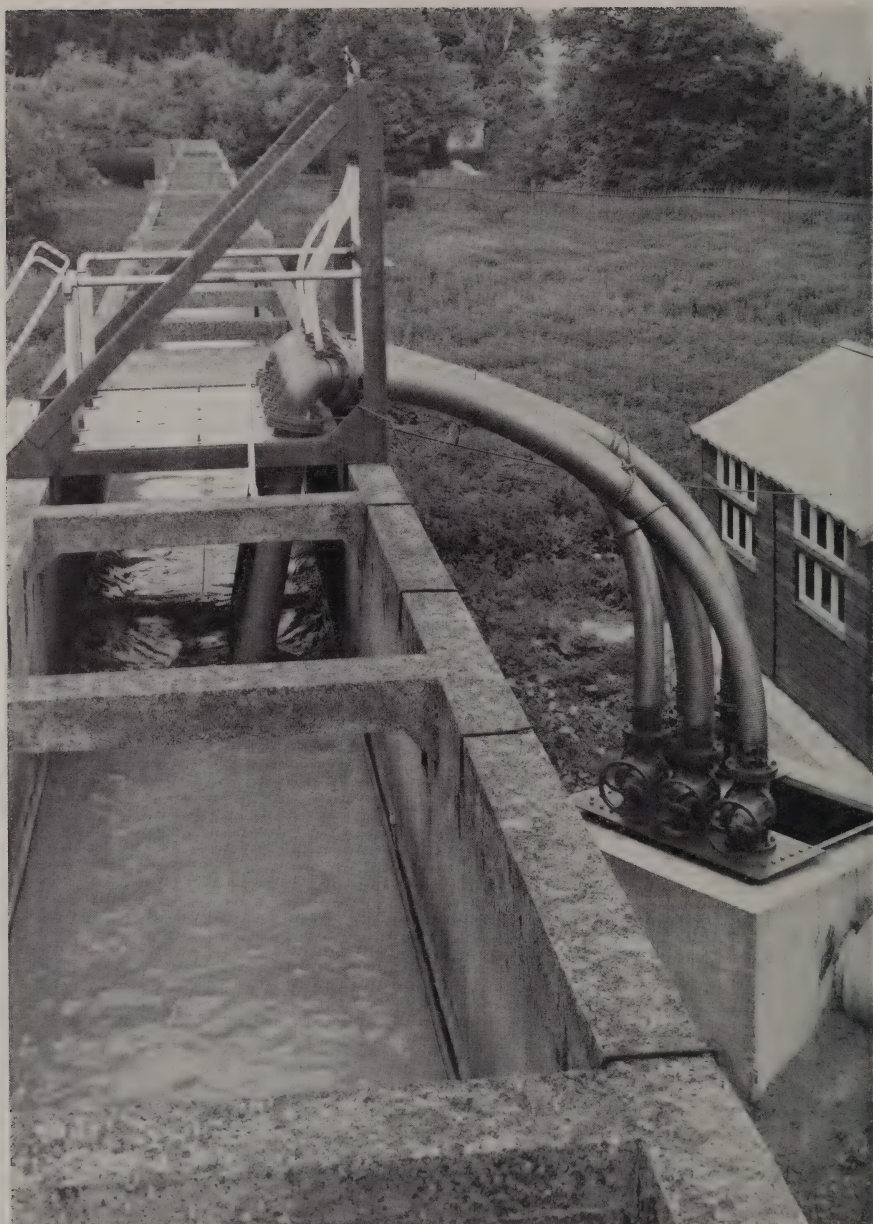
GENERAL ARRANGEMENT INSIDE STORM TANK SHOWING HIGH SIDE-WEIR OVERFLOW UNDER TEST.
